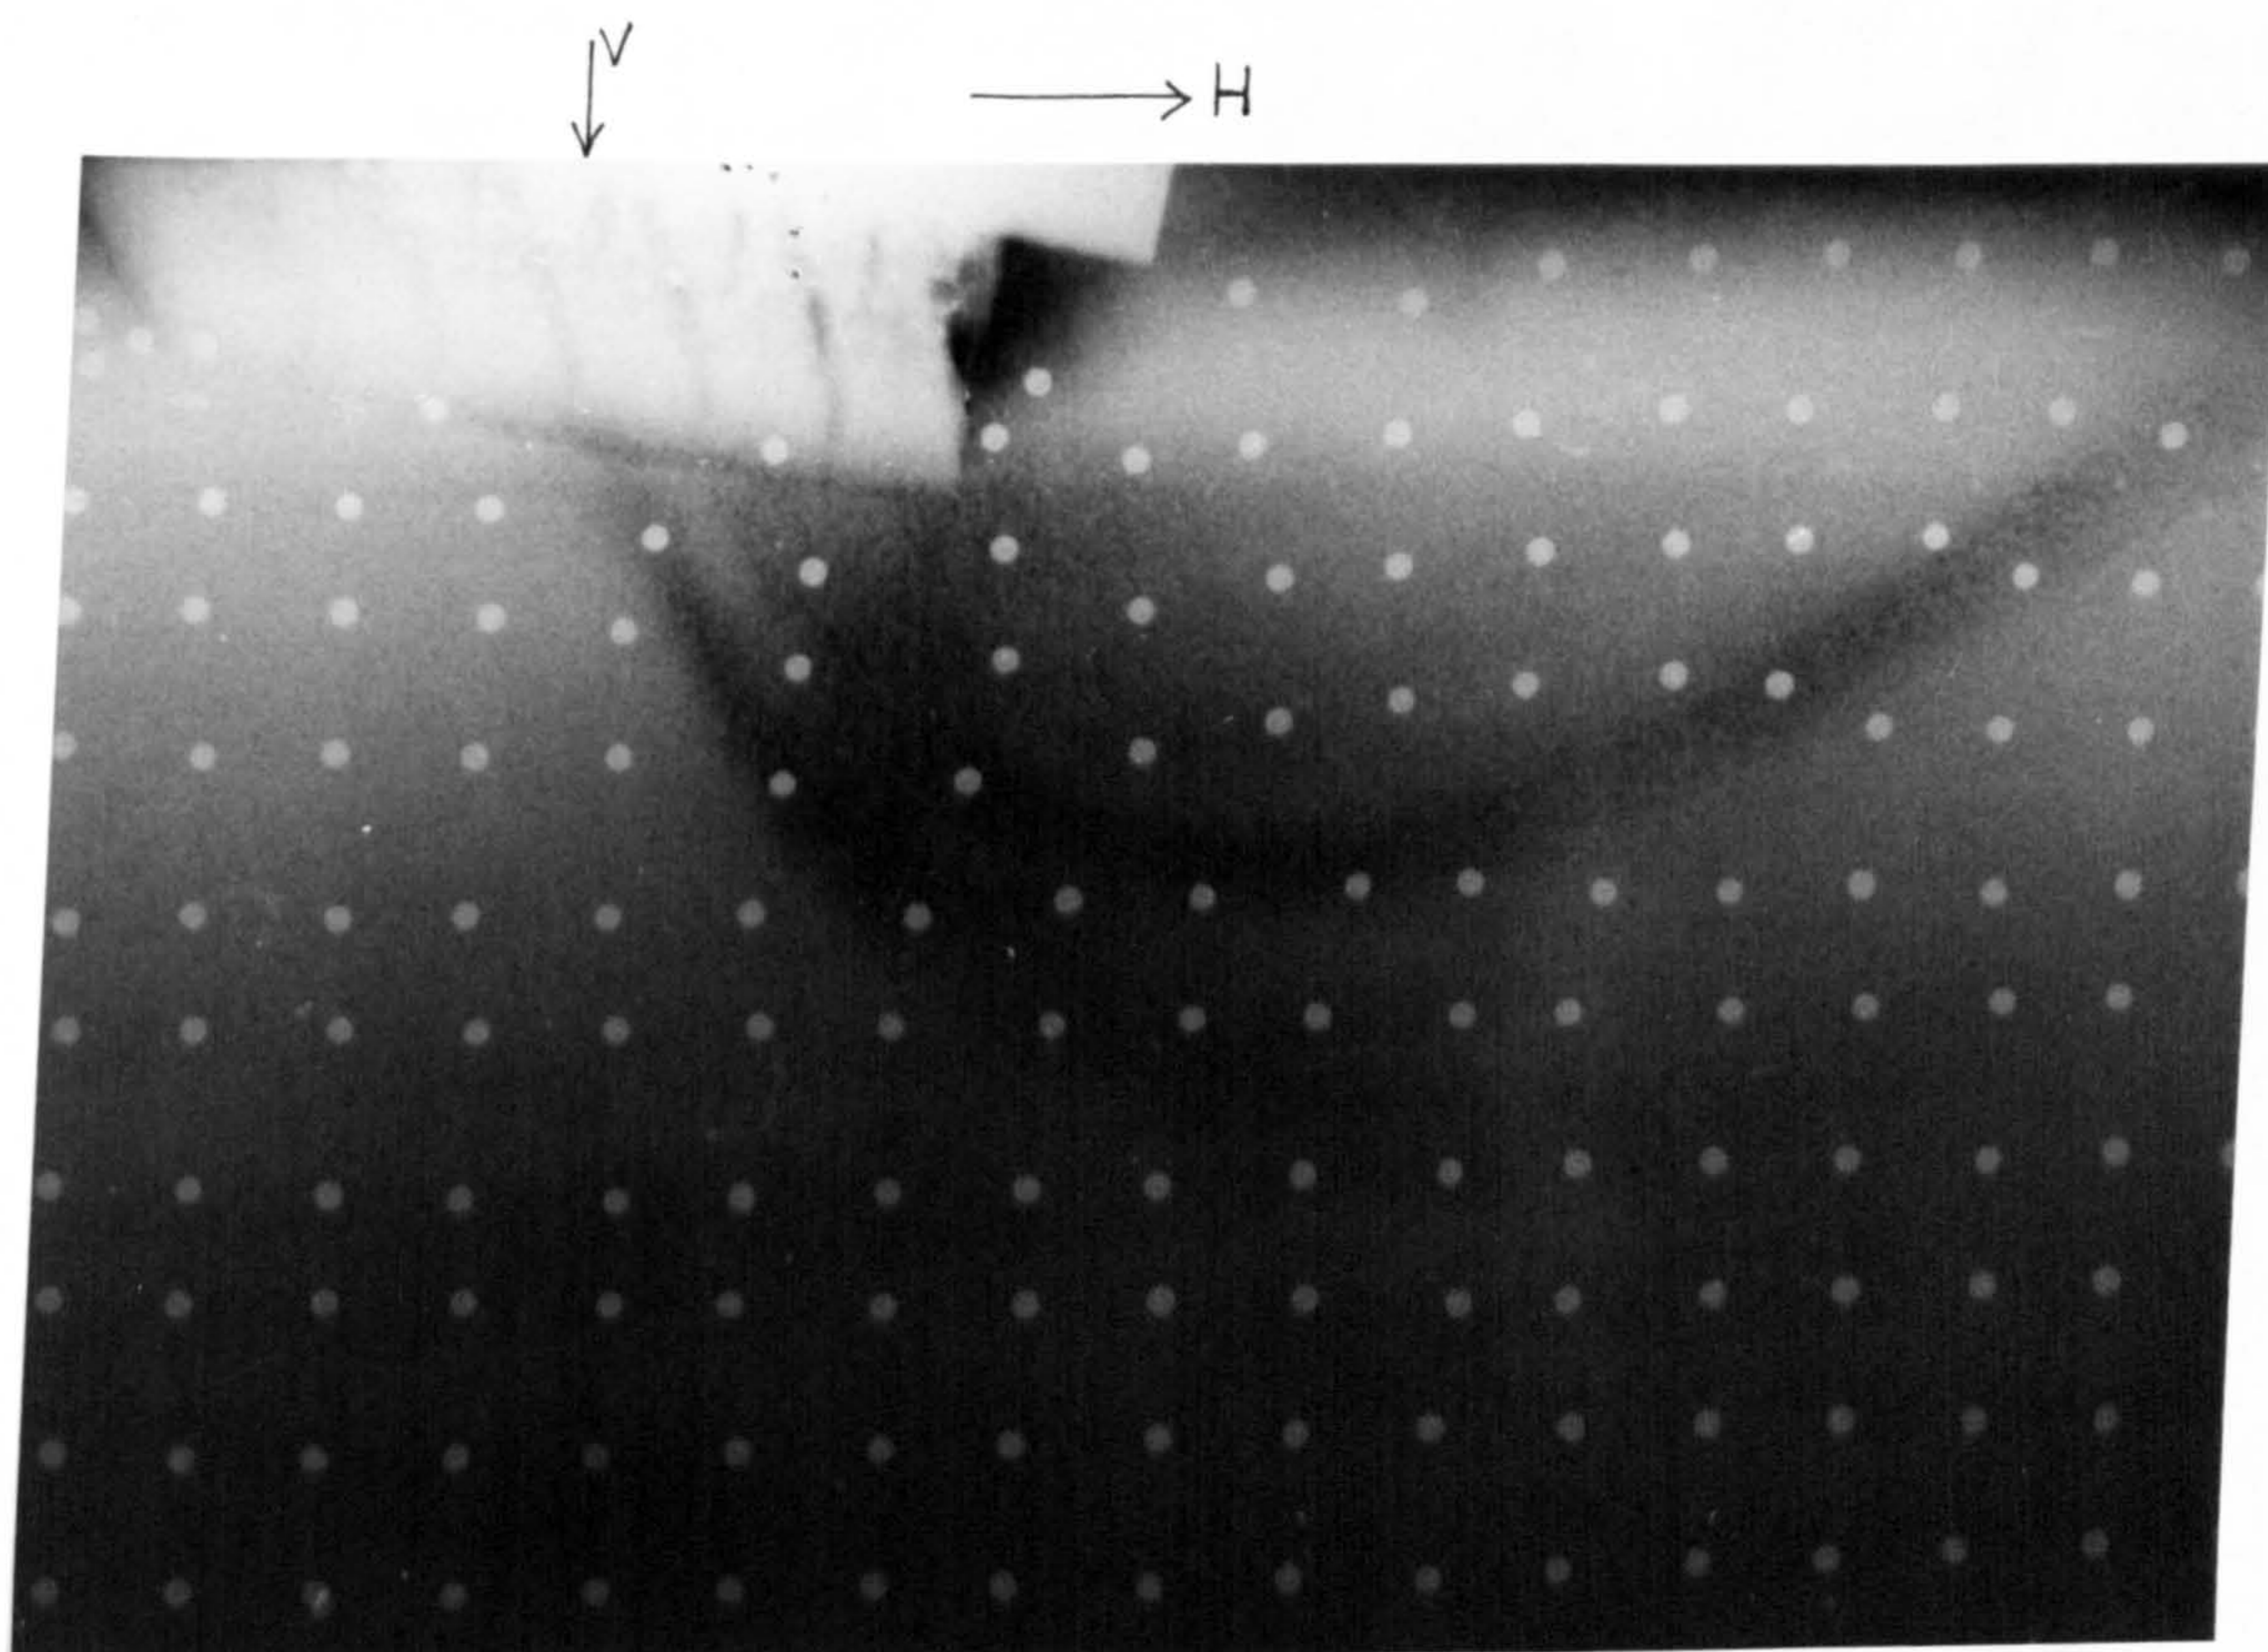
The failure surface in test F($e_o=0.52$, independent horizontal load at 100 mm from the footing base).
